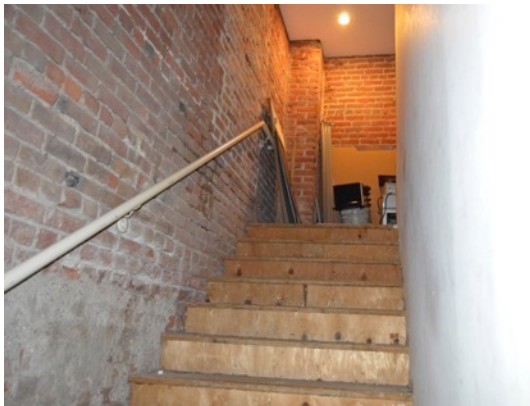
Stairs to first story at rear of building in the basement, looking south.
